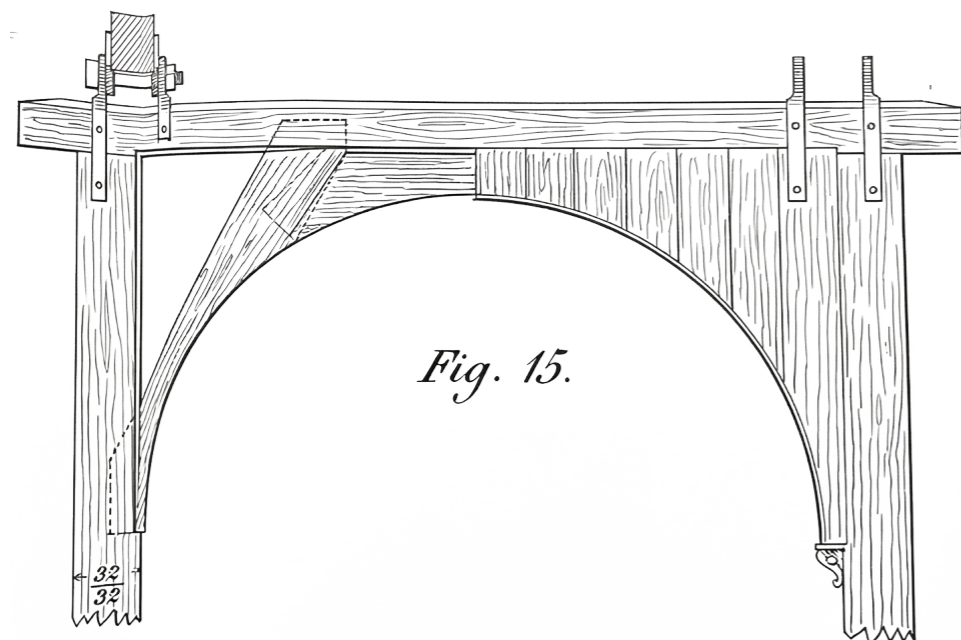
Wooden drawbridge (cutaway structural detail) (Henket et al., 1889)
